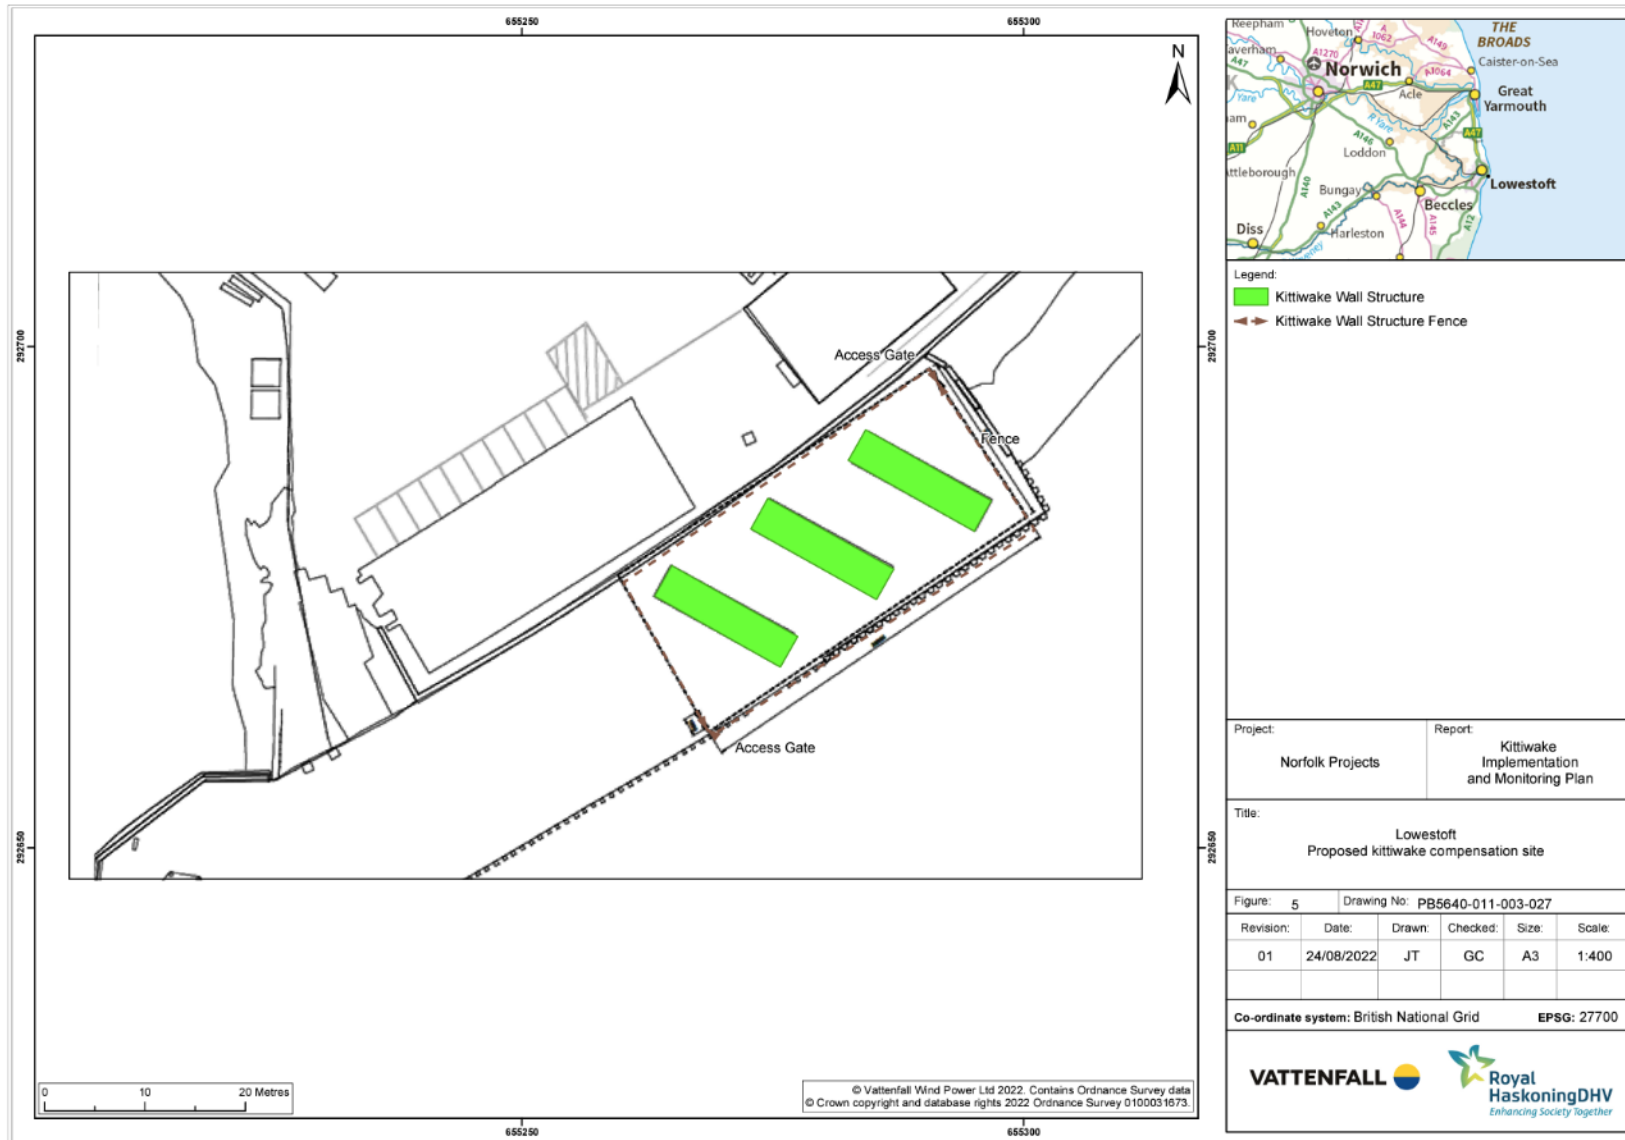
Proposed site layout of kittiwake wall structure at the port of Lowestoft
